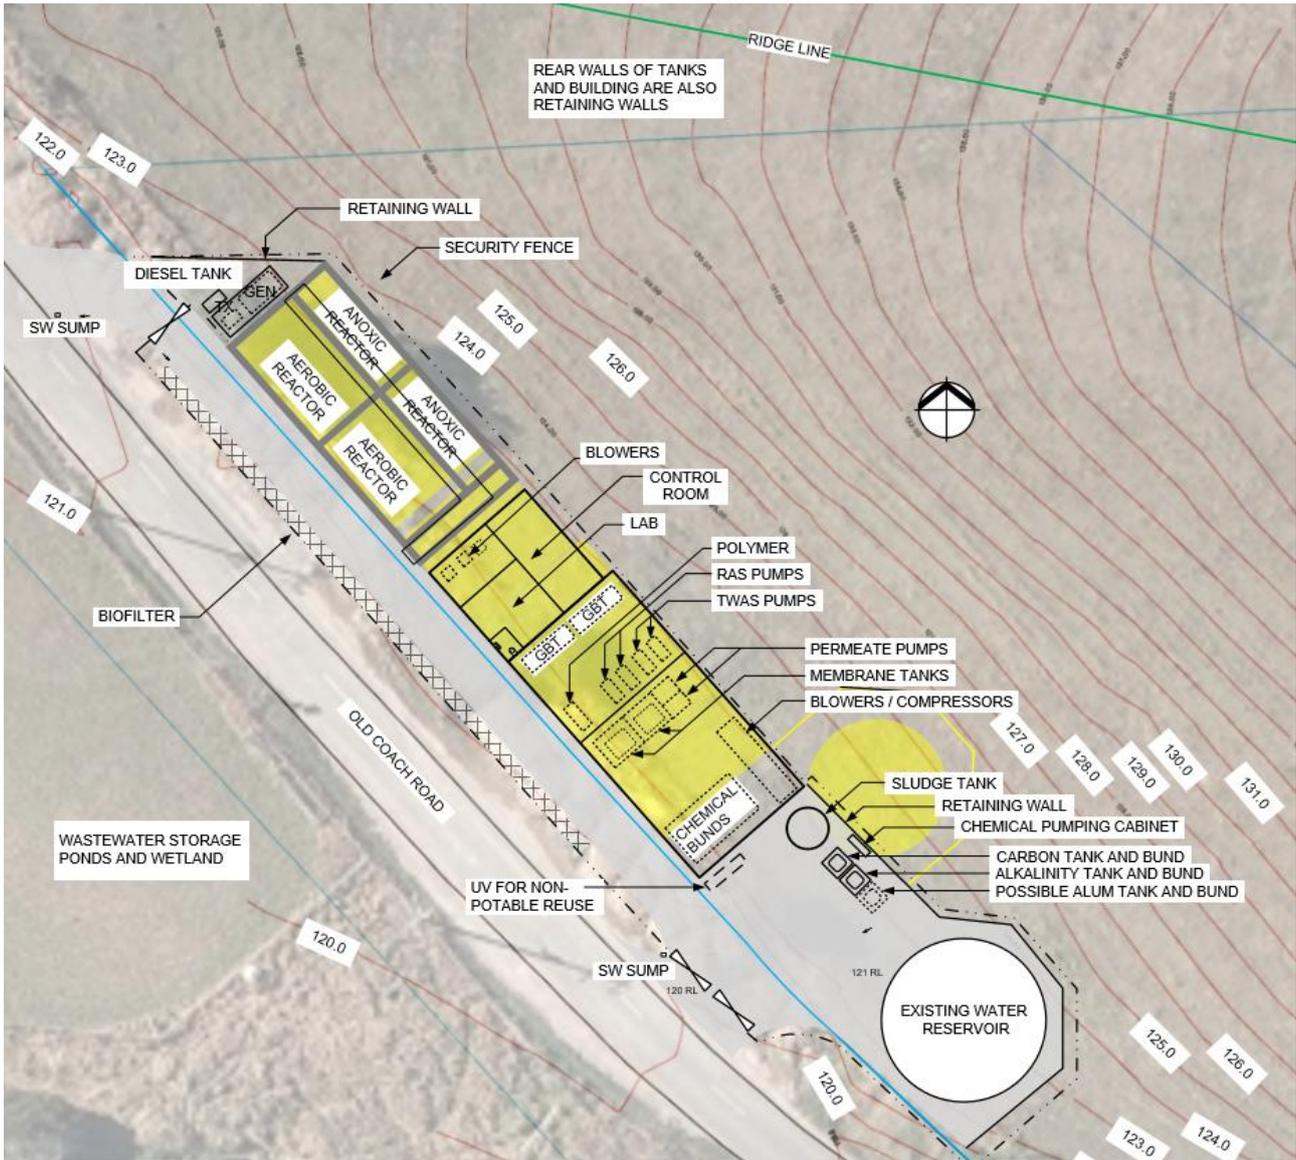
Concept Treatment Plant Layout (previous concept in yellow, storage pond not shown)
